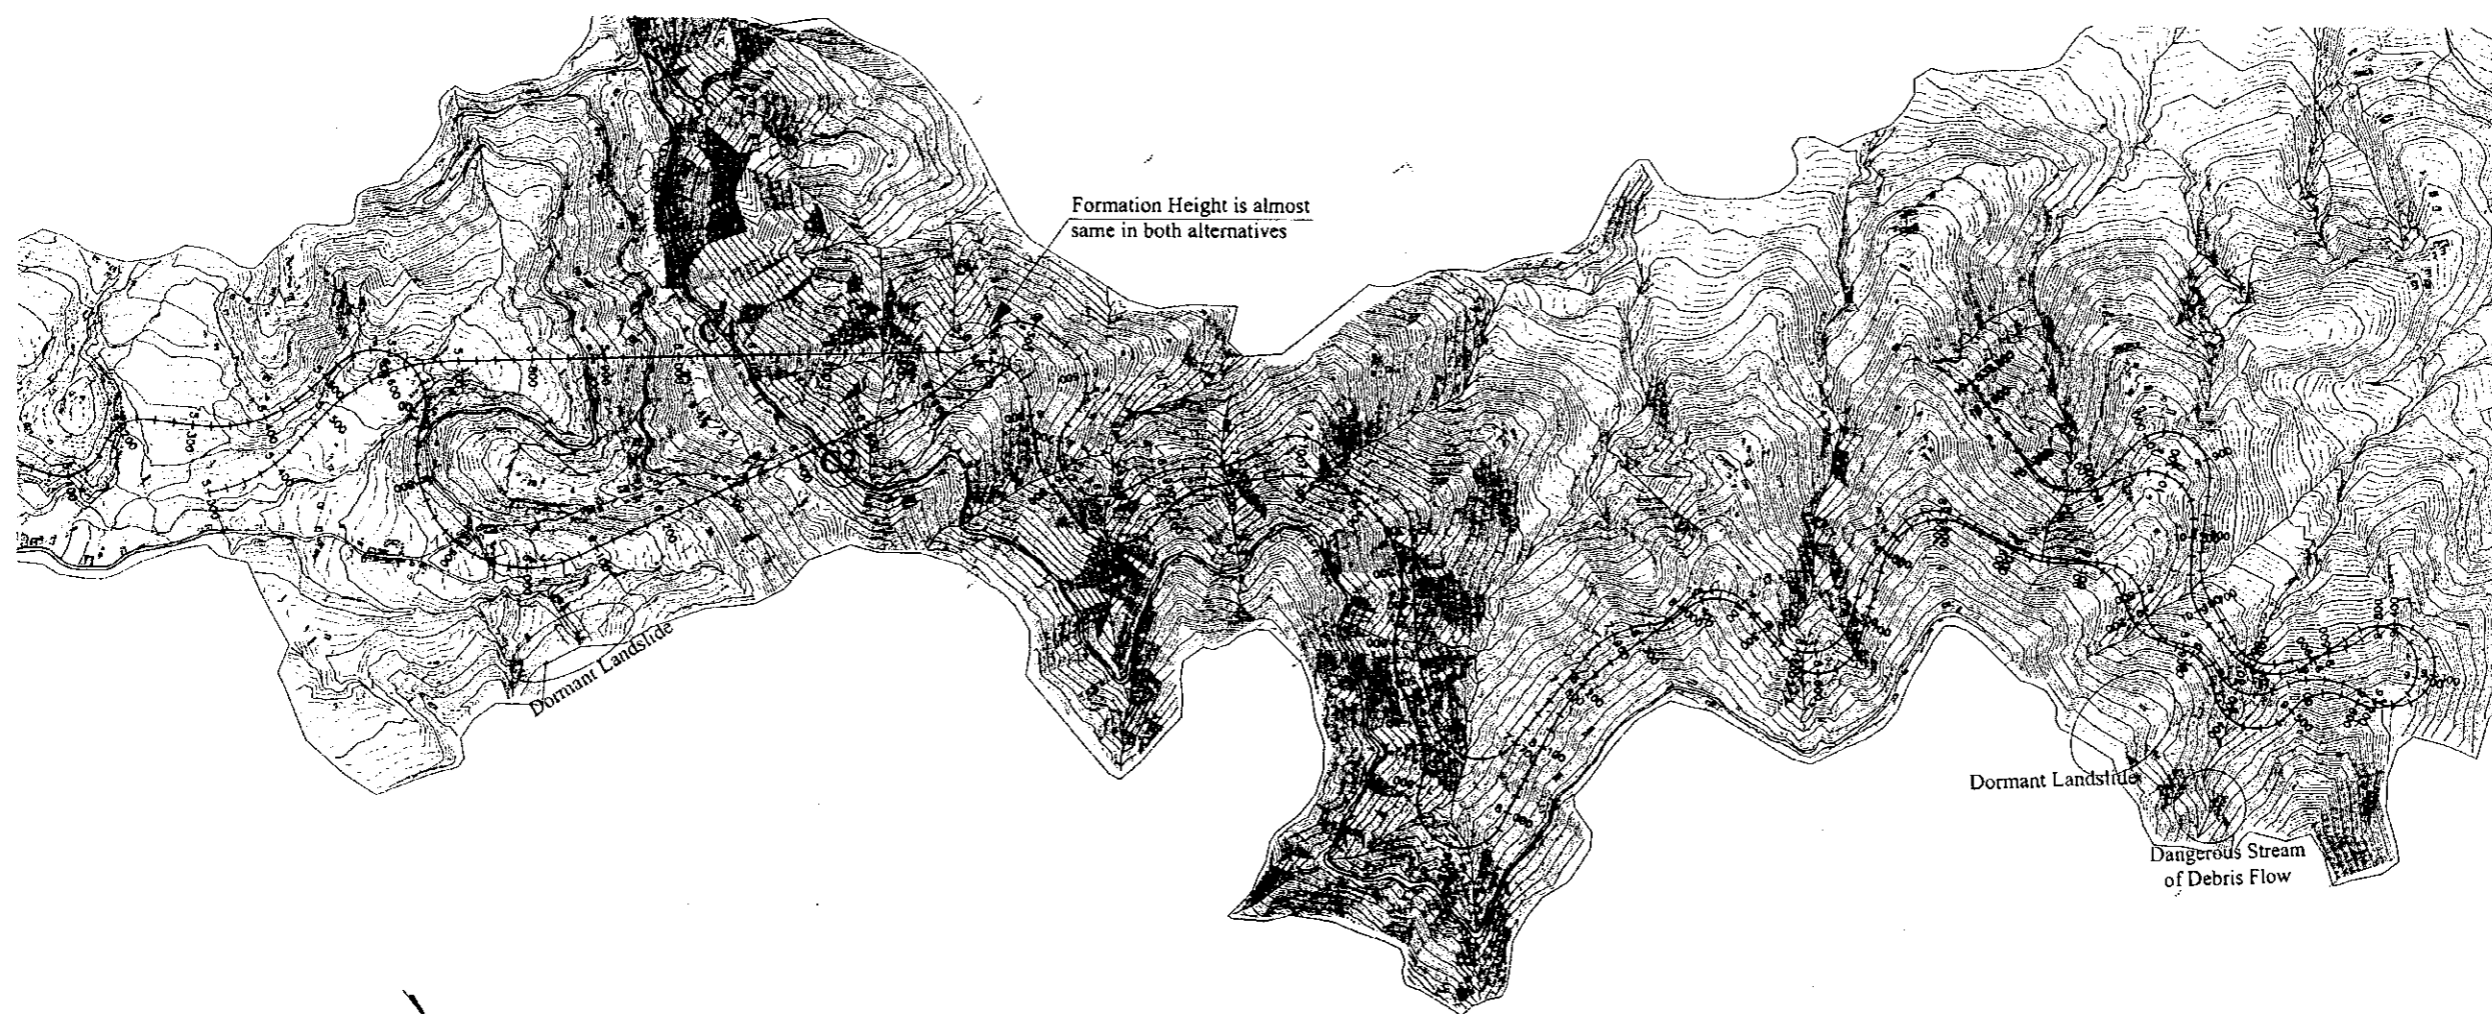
Alternative Alignment C4 of Short Tunnel
